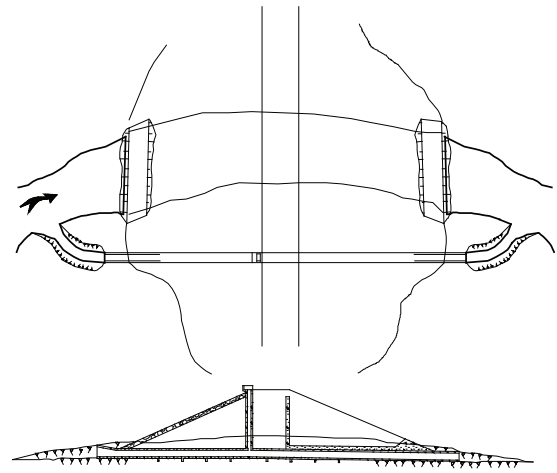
River diversion through a gallery under the dam – plan and cross section.
